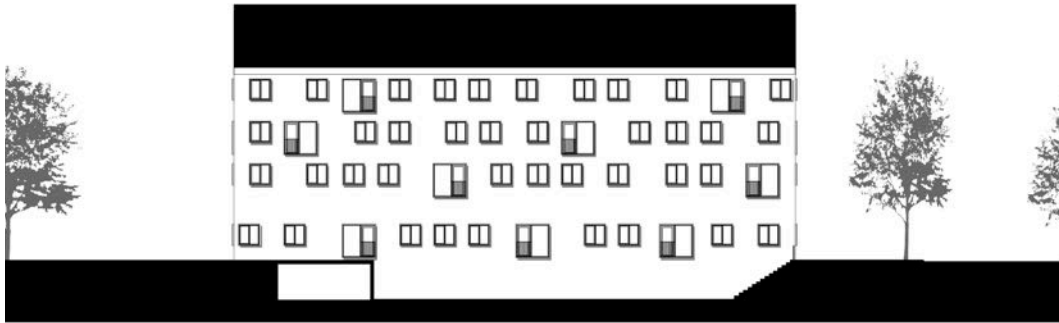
Sems Have, Block A. East and west elevations (1:500)
